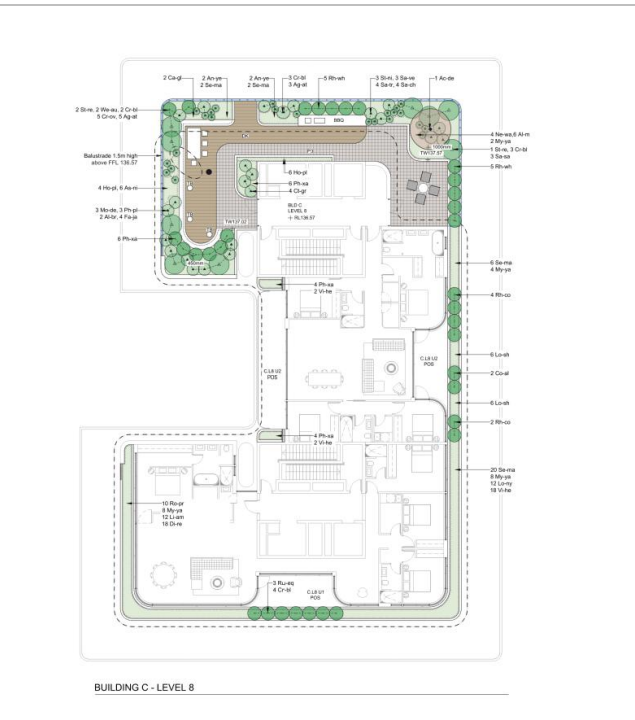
Revised Building C Rooftop landscape plans (Source: Studio IZ)
